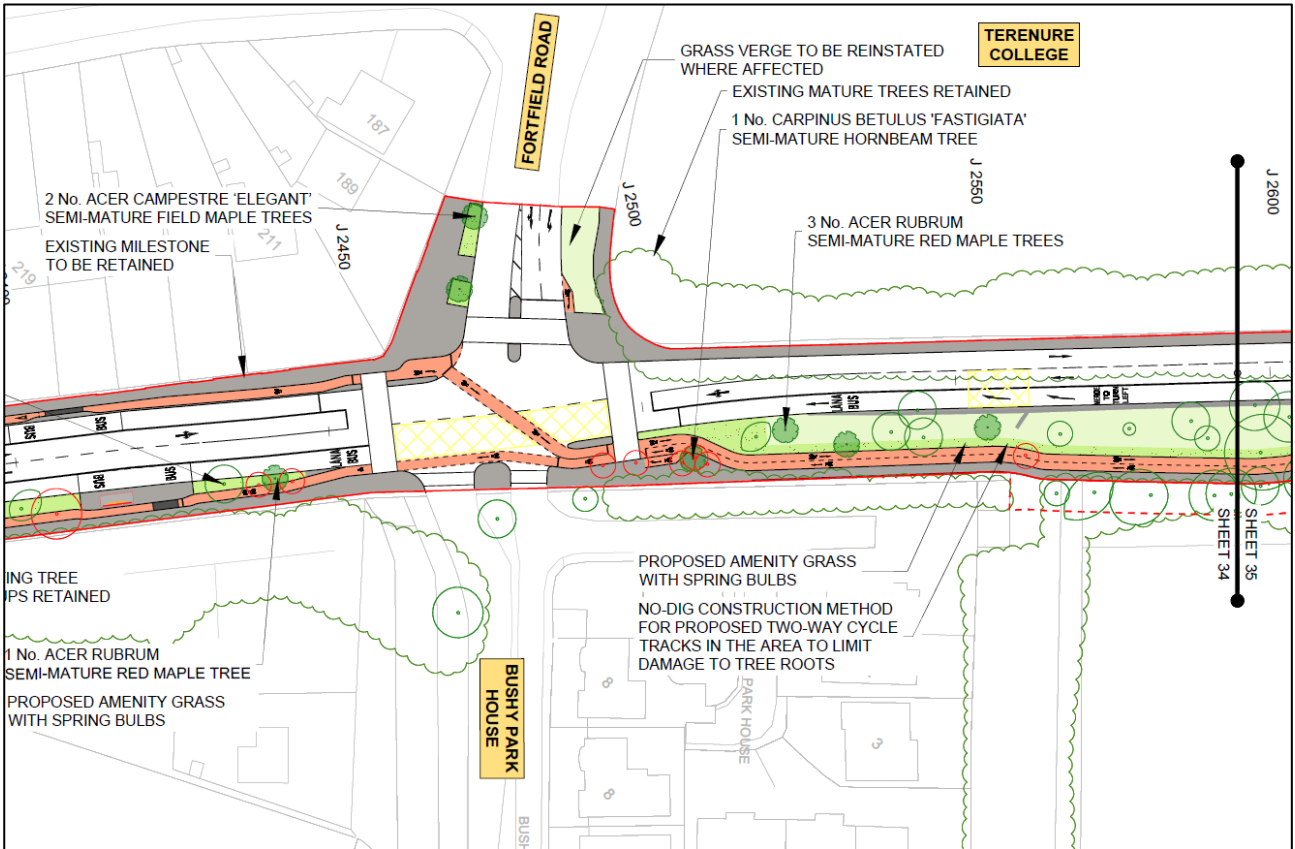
Extract from Landscaping General Arrangement Drawings (Sheet 34)
